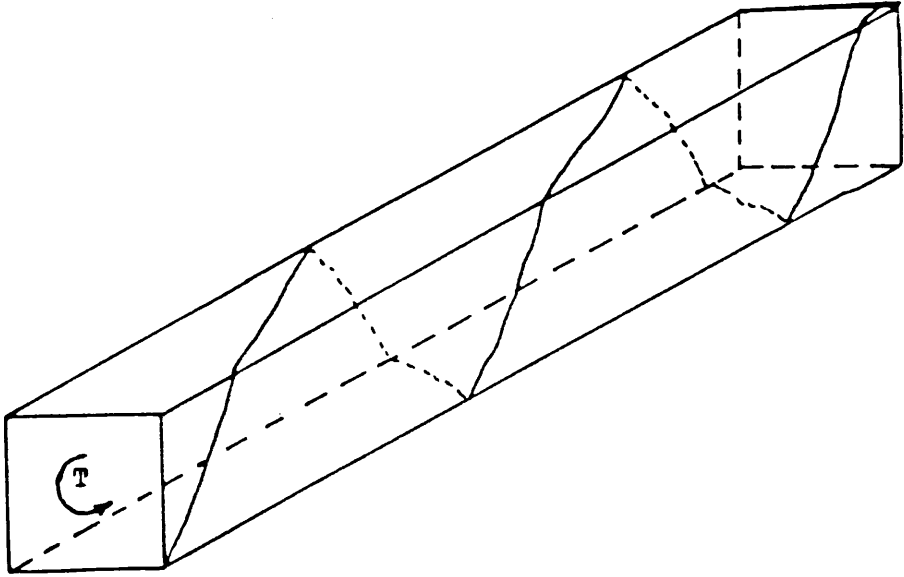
a Helical Crack on plain Concrete Beam under pure Torsion .
